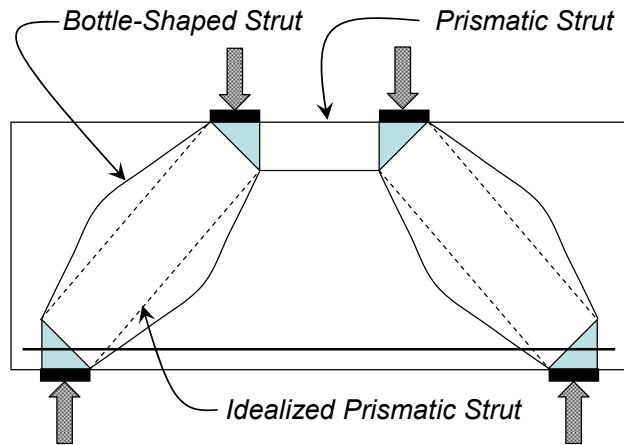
STM containing prismatic and bottle-shaped struts.
